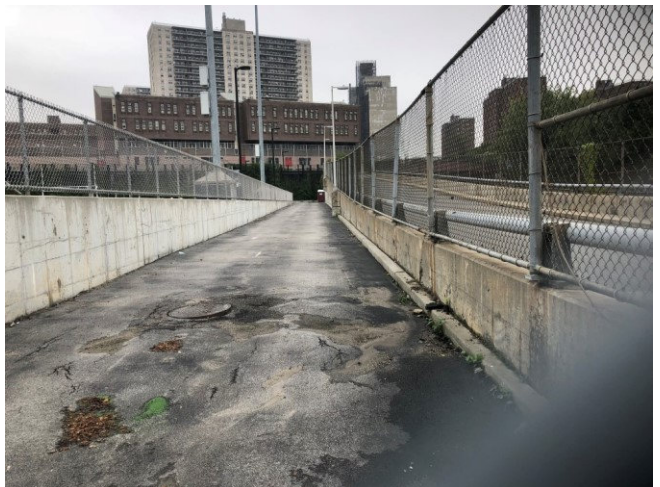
View of damage on the asphalt pavement at the fire lane exit gate.
